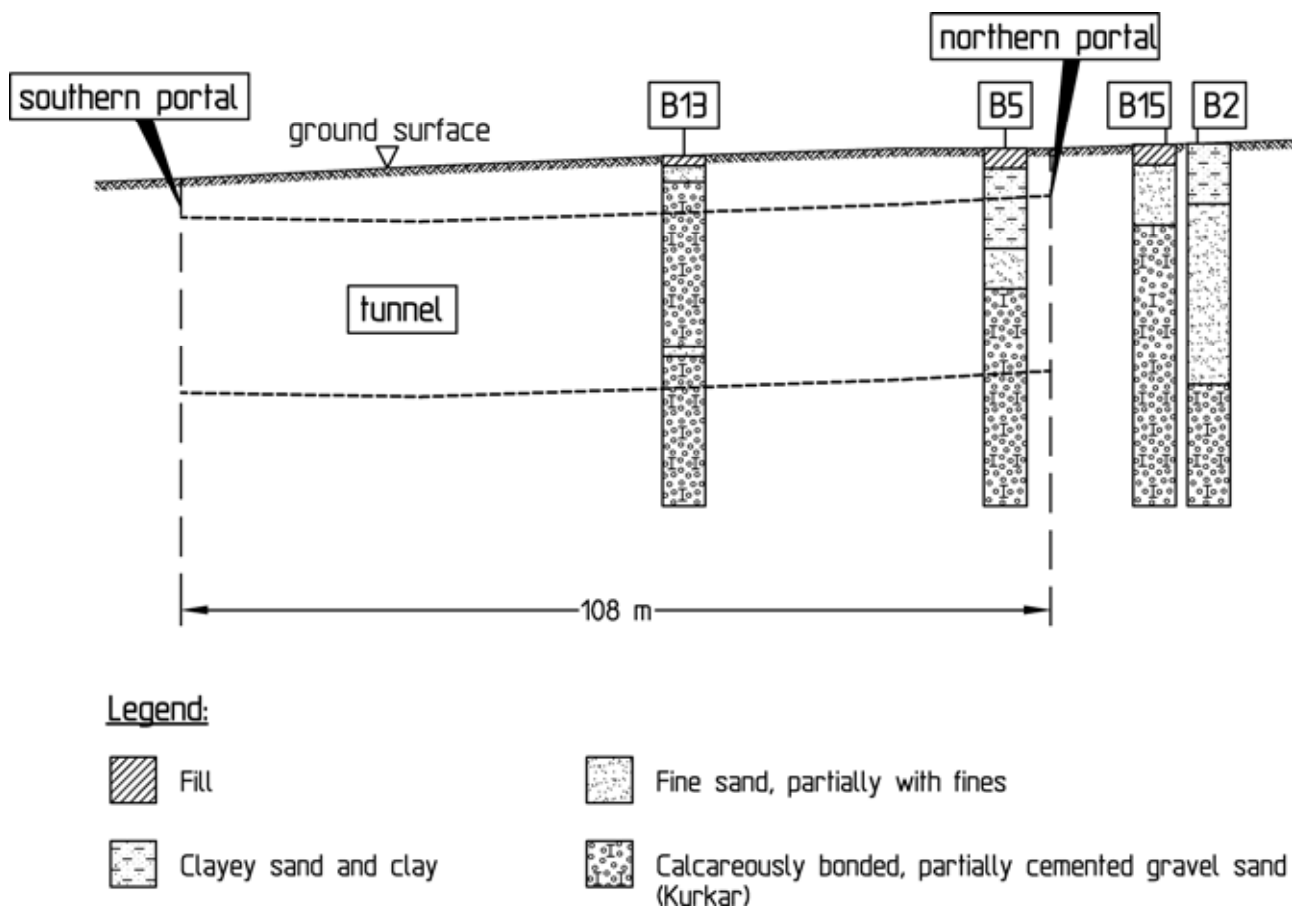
Elite Tunnel, longitudinal section with drill logs
